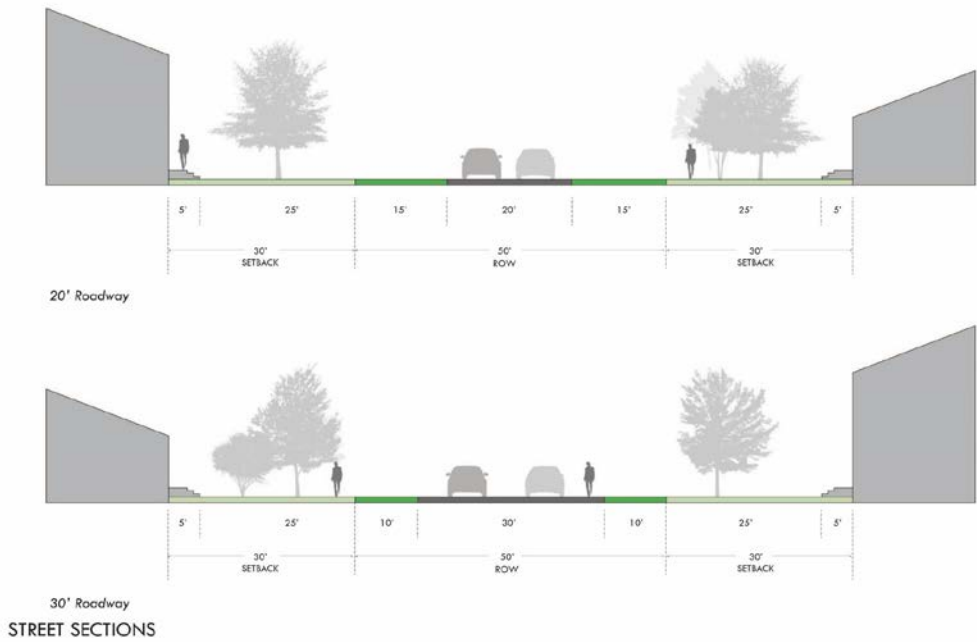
STREET CROSS-SECTIONS WITH PORCHES
